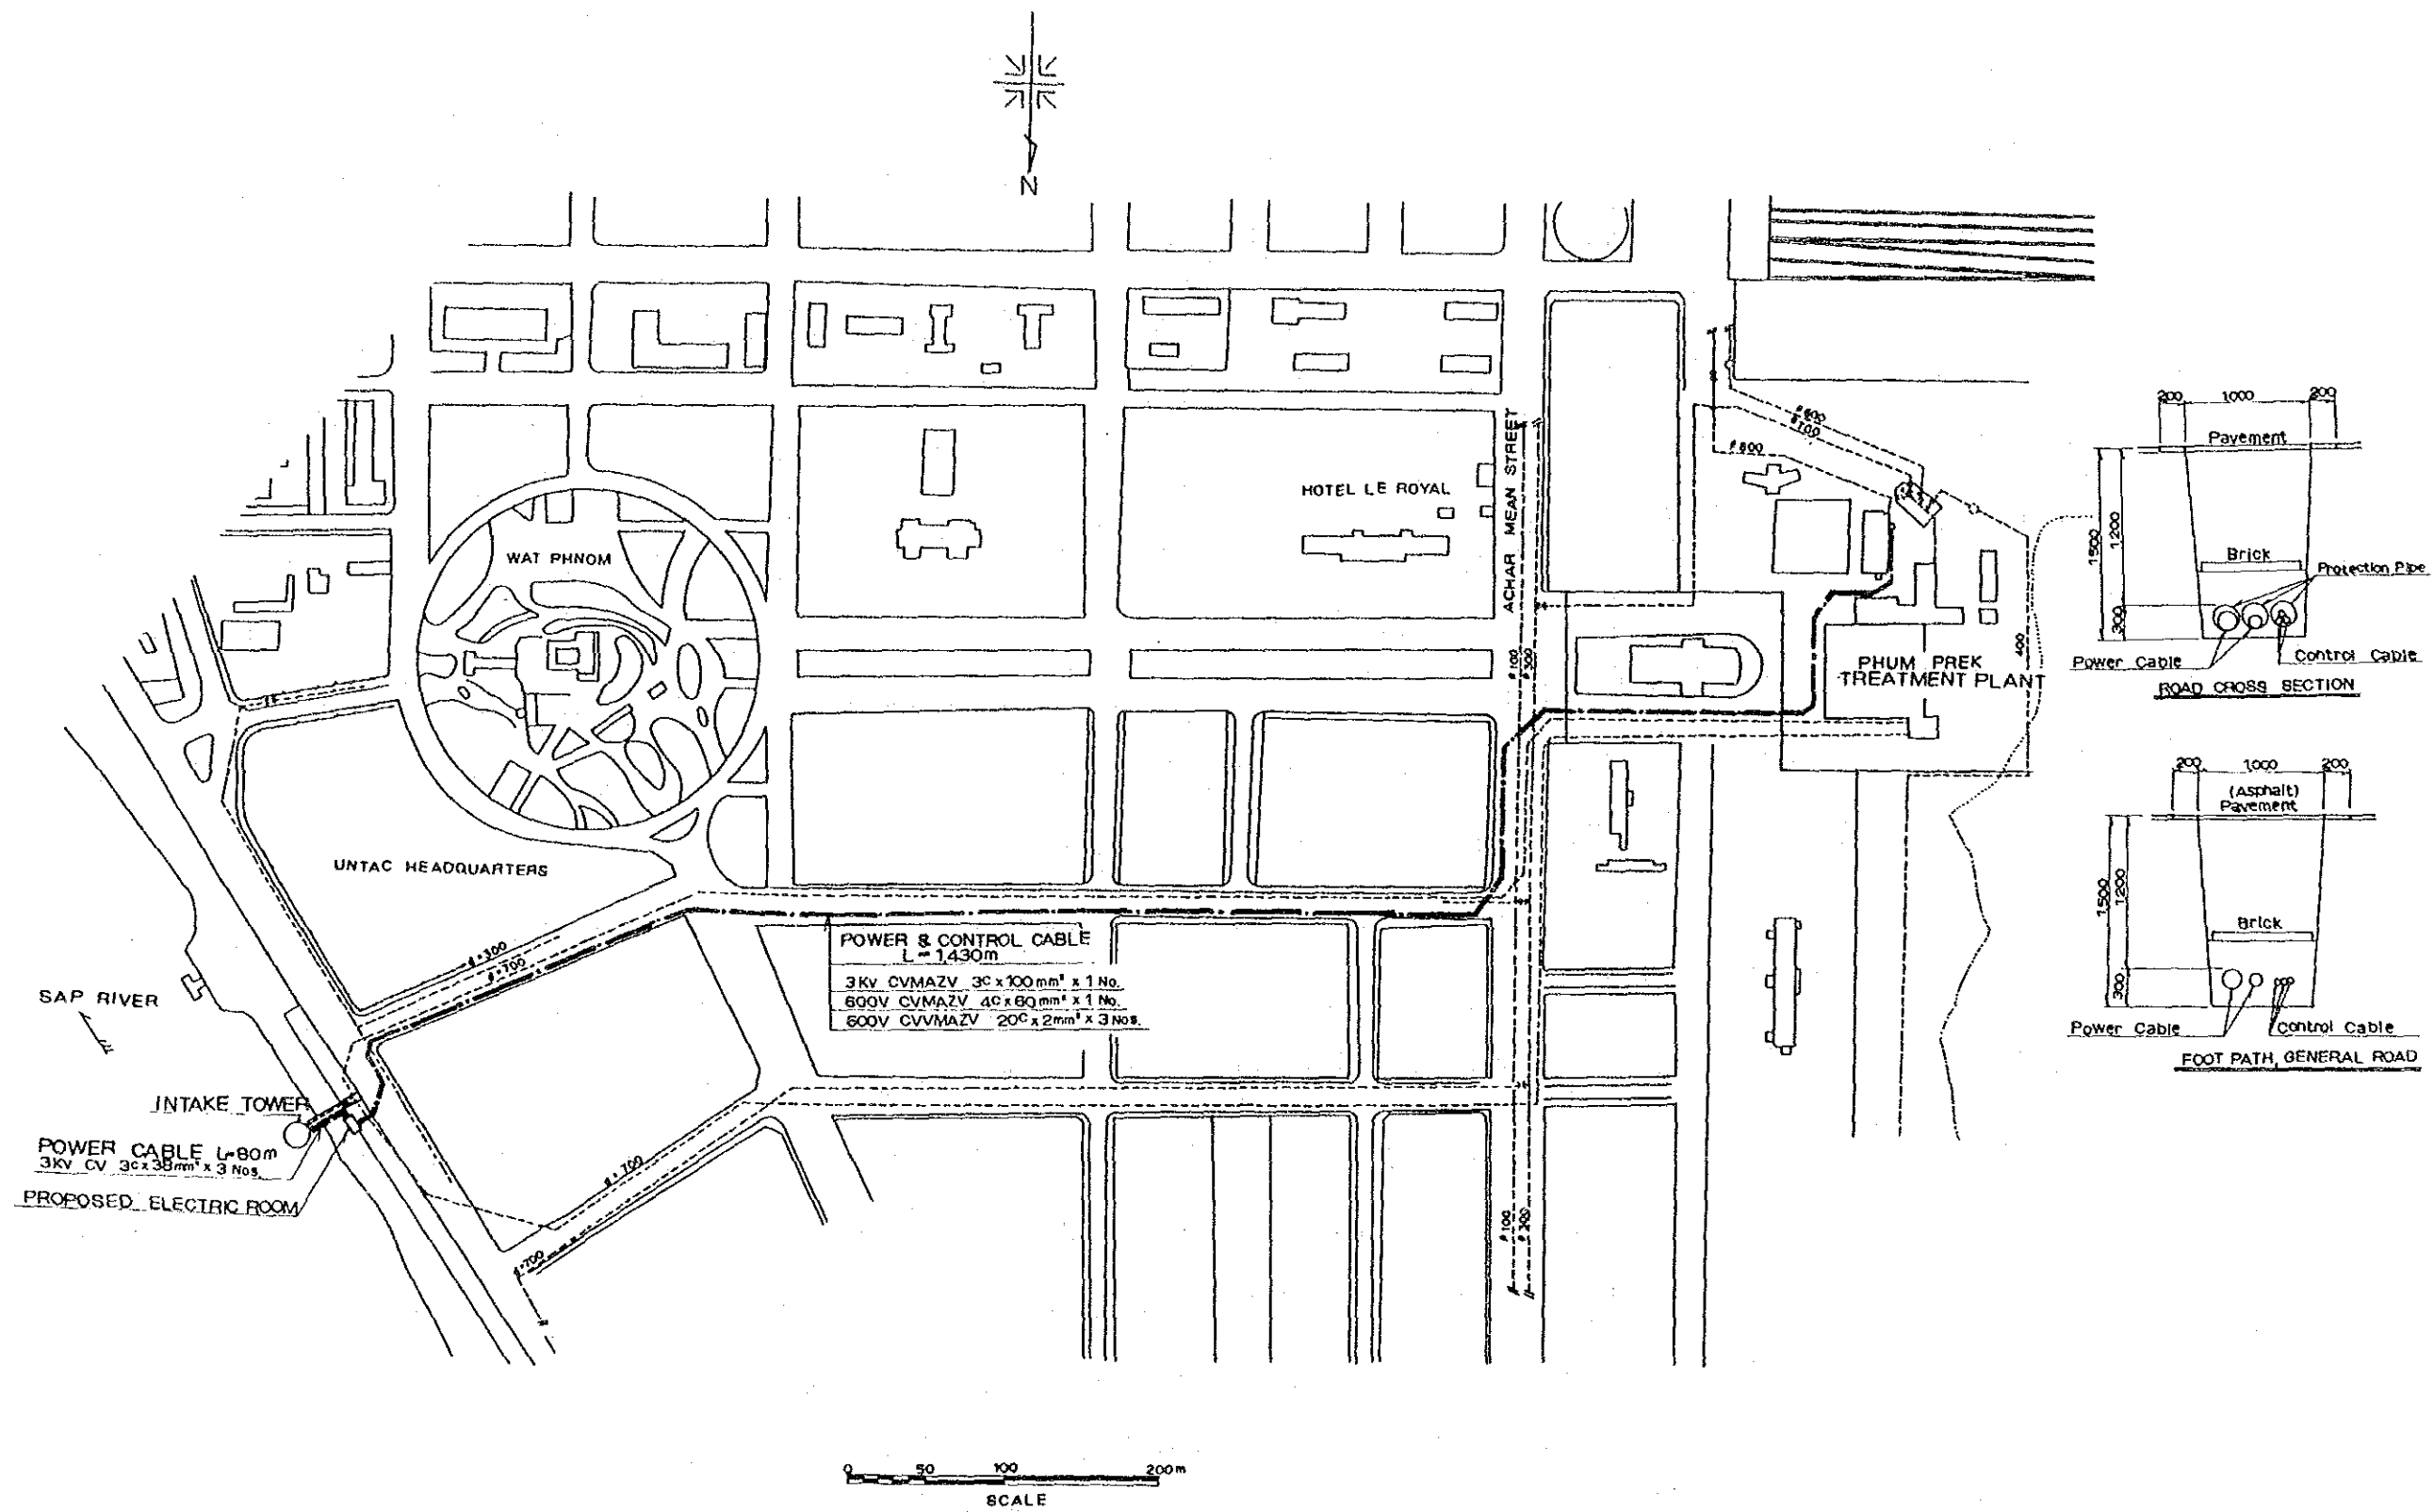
CABLING PLAN FOR RAW WATER INTAKE
